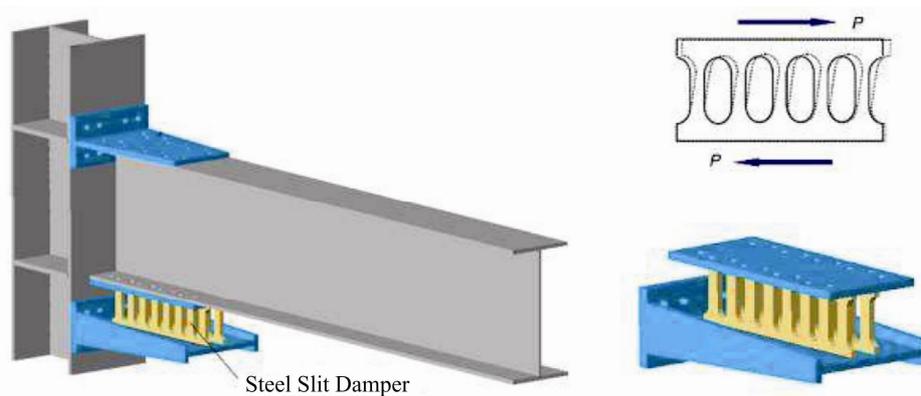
Steel slit damper connection (Oh *et al.*, 2009).
